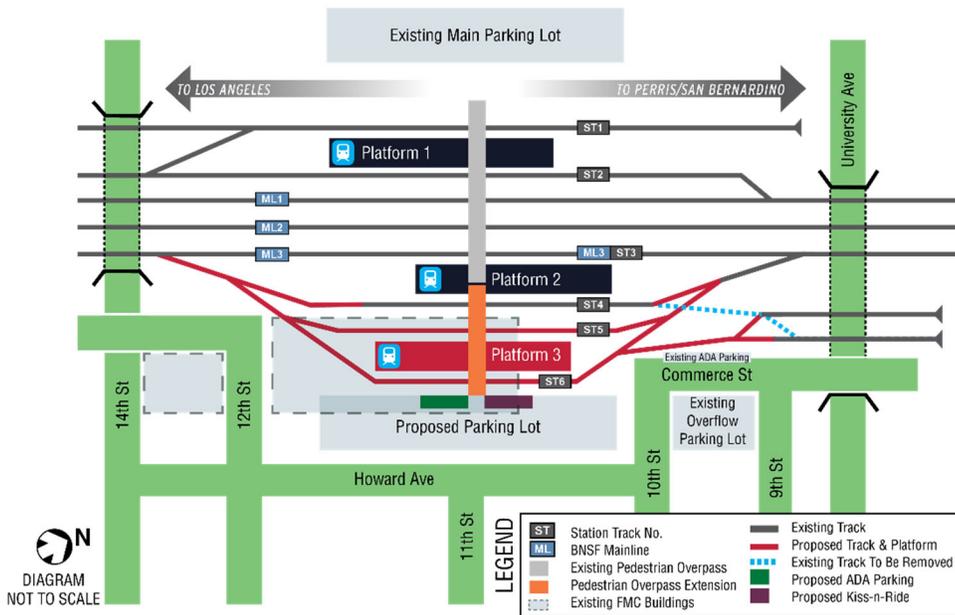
Build Alternative with Pedestrian Overpass Access Design Option 1
